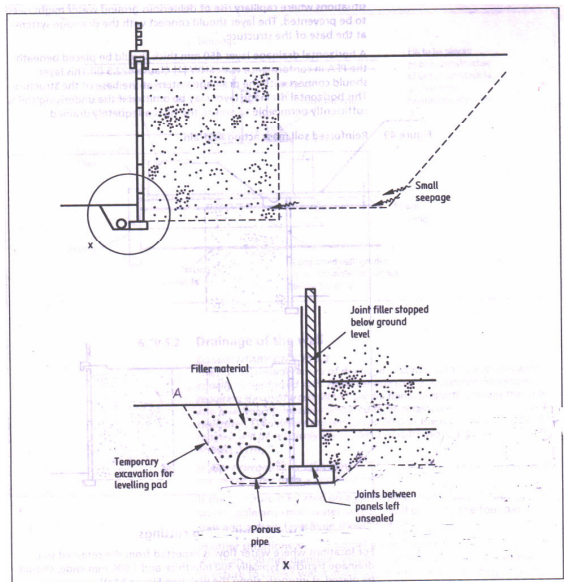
(f). Details of RE wall foundation and fill drainage updated by BS 8006-1, 2010.
